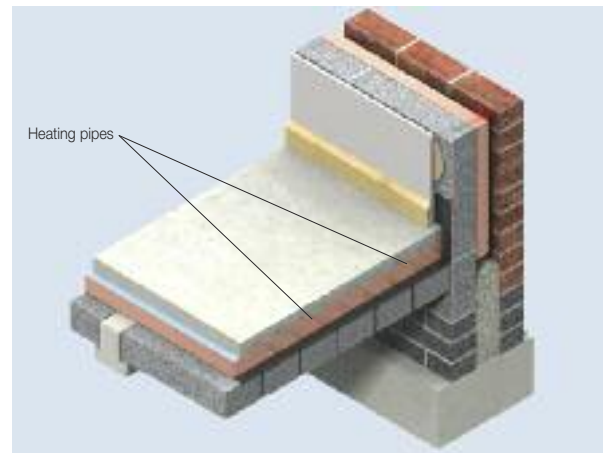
Intermittent Heating Applications – Beam and Block Floor
